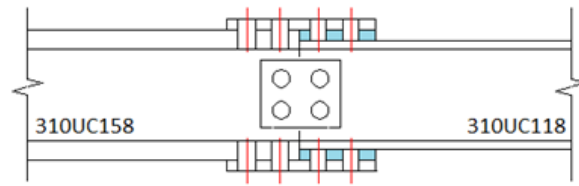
Schematic view of Specimen #1, (12mm flange plates and 6mm filler plates)
